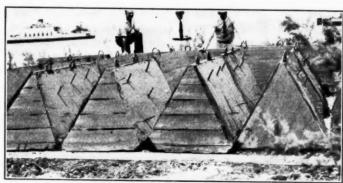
Precast Asphaltic Concrete Blocks for Side Slopes in Underwater Construction.
